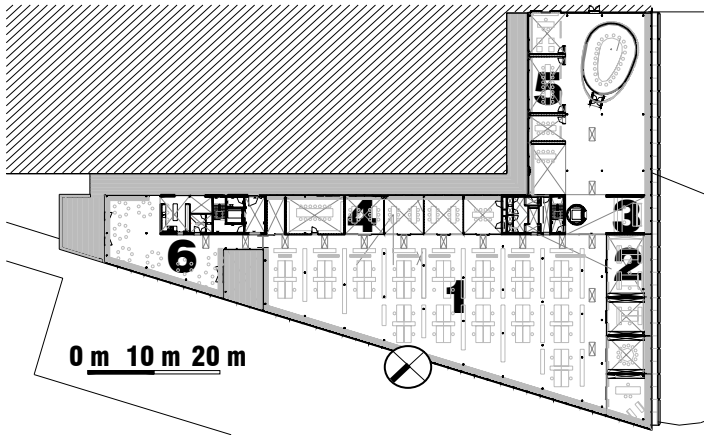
Plan of second floor with landscaped office (n°1), accounting and management section (n°2), reception desk (n°3), internal (n°4) and external (n°5) conference rooms and service rooms (n°6)
